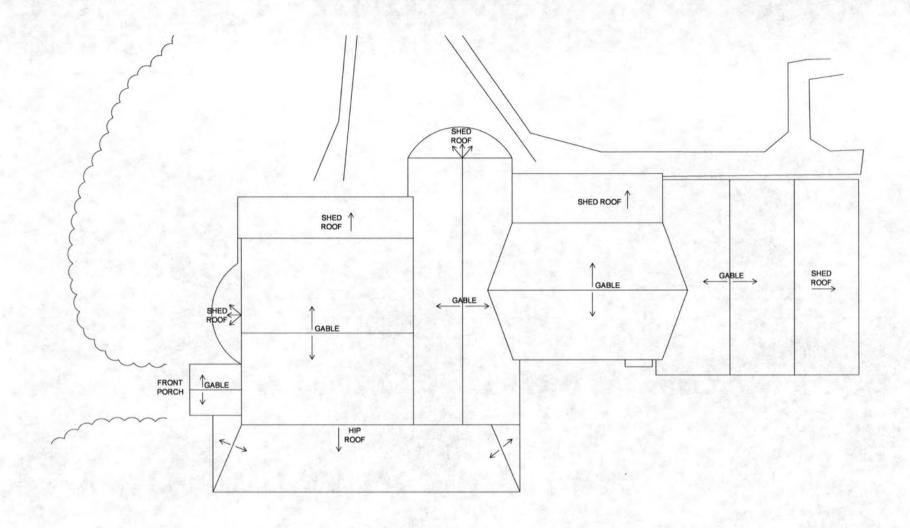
FIGURE E - BUILDING 1, RANCH HOUSE ROOF PLAN
